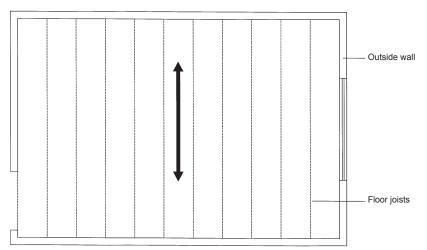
For carpeted floors, install Quik Trak panels parallel to the exterior wall to allow the warmest water to reach the coldest area first.
